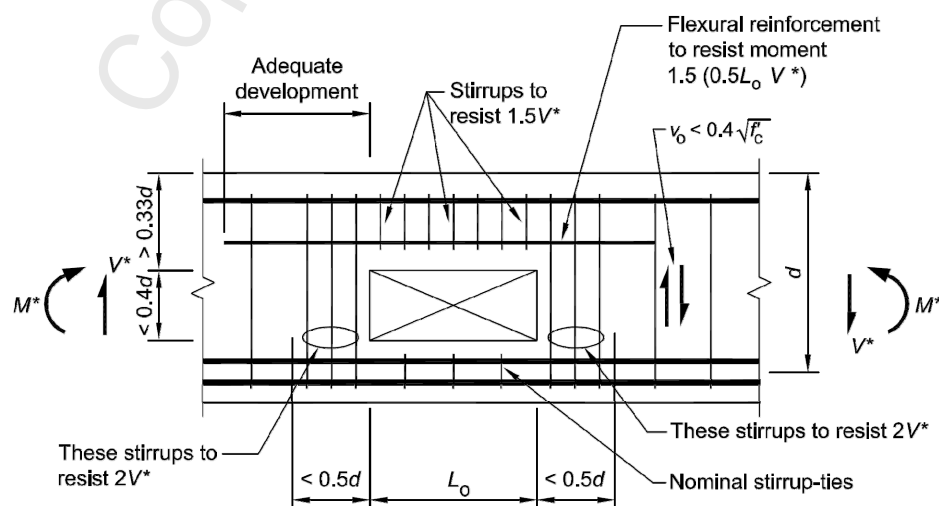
Detail of requirements at a large opening in the web of a beam
